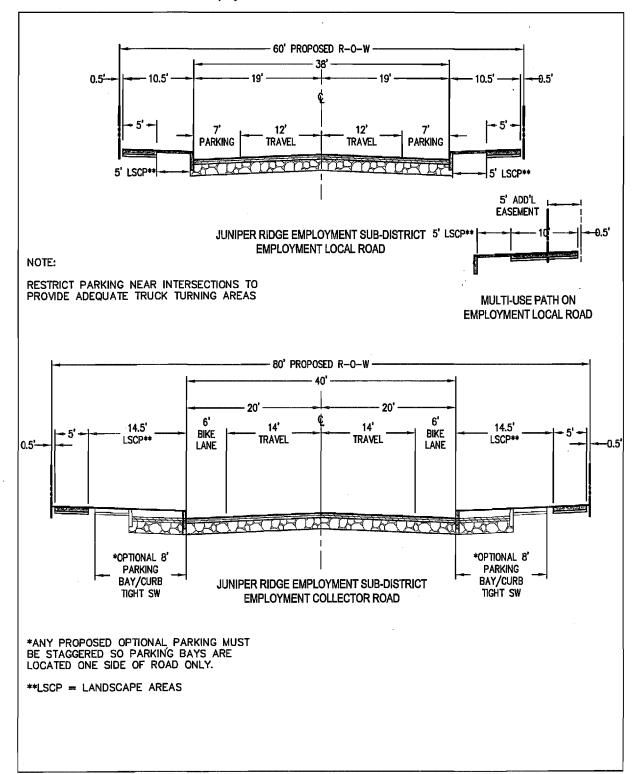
C.2 Employment Sub-District Street Cross Sections
